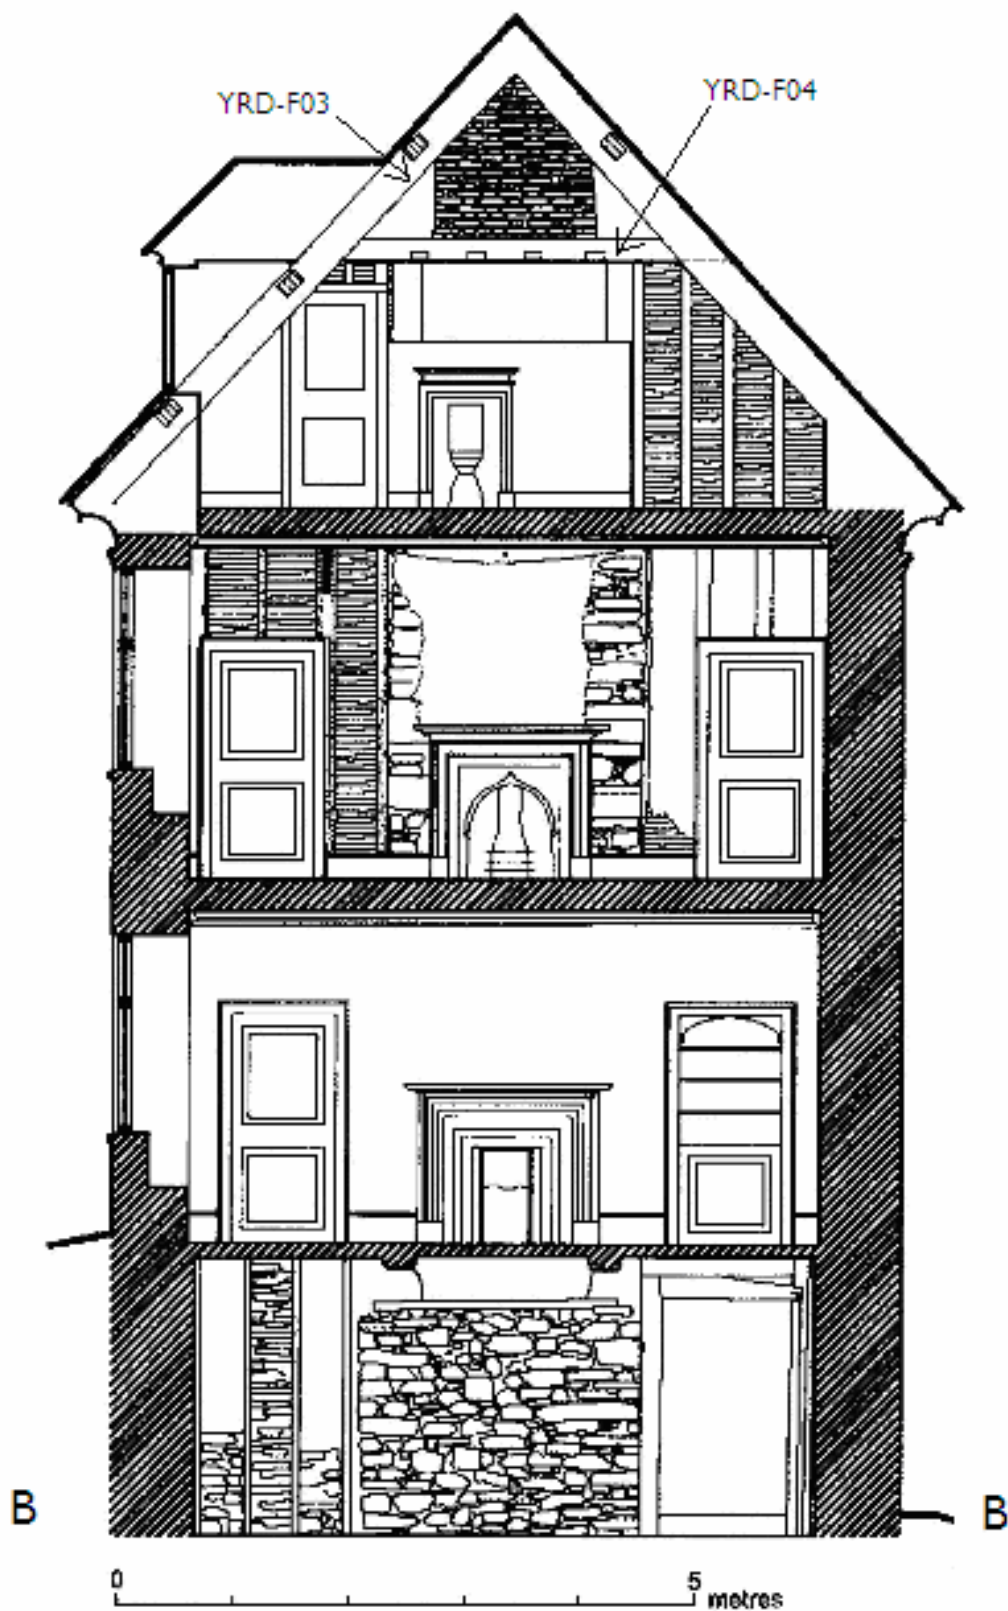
South range; east facing section B-B, showing the location of samples YRD-F03 and YRD-F04 (John Allan, location of section marked on Fig 8)
